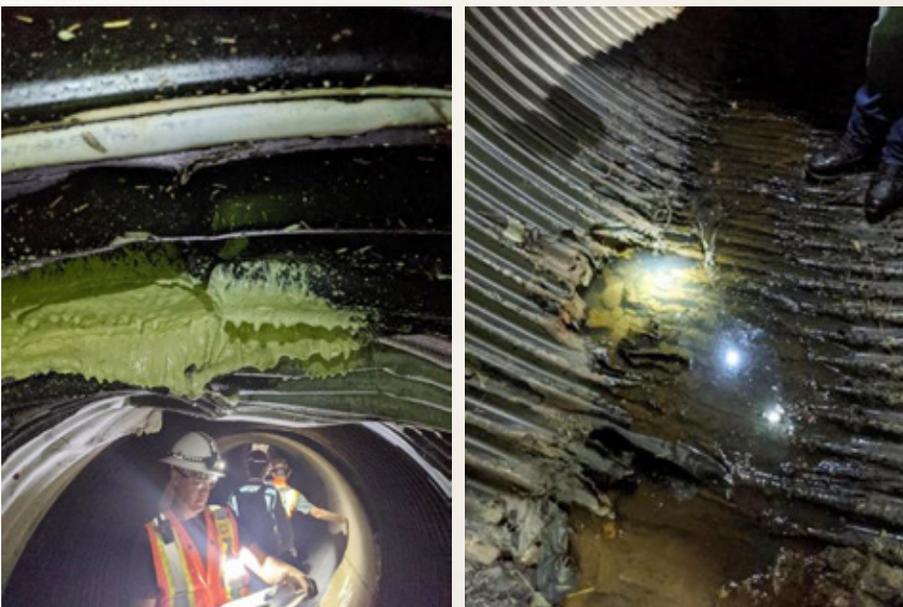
Vertical deformation and point patch repair in pipe crown at joint (left) and typical surface corrosion in pipe invert (right) (Courtesy of Oxford Avenue Storm Sewer Outfall Condition Assessment Report, prepared by Lithos Engineering)
